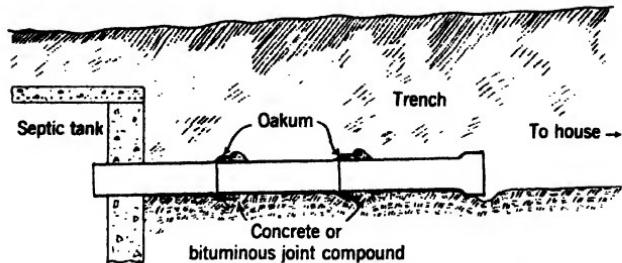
Method of laying vitrified bell-sewer tile using oakum and cement mortar to seal the joints.
